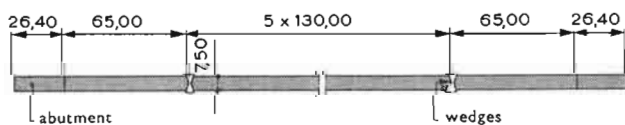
Diagram of the other prestressed concrete experimental section with abutments, etc. at Salzburg
